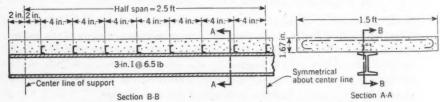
Details of Beam Specimen, T-Beam Tests of Shear Connectors
